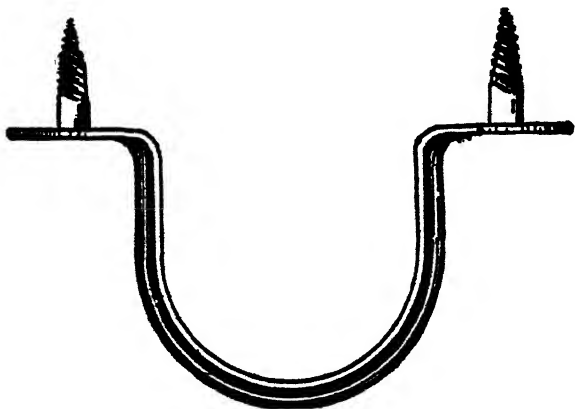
Pipe-strap for fastening sash-bars to purlins.
